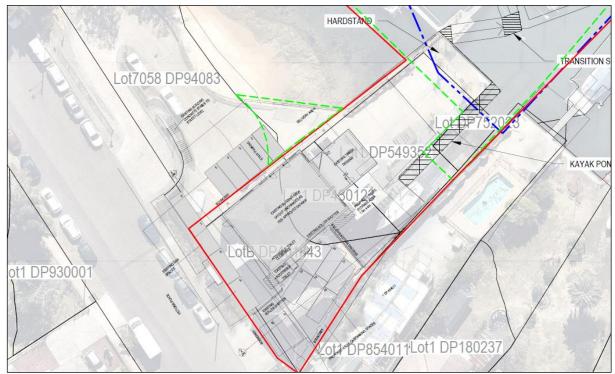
Site boundary (Source: extract of GHD Drawing No. 21-27558-K301, Rev B)
